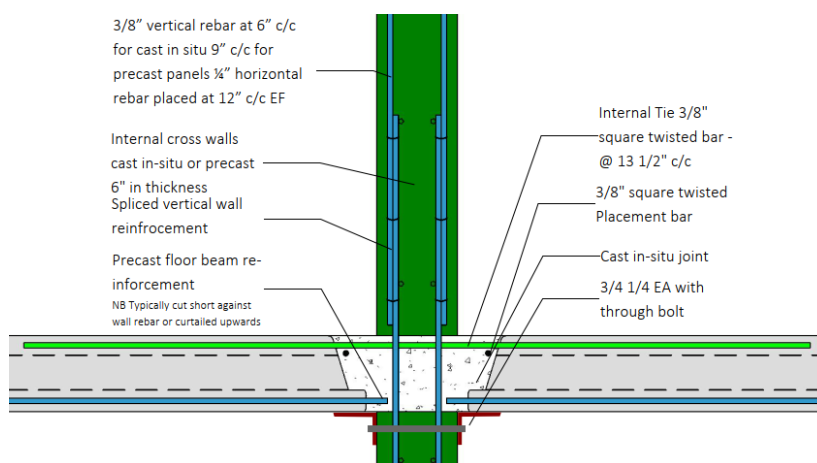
Observed Internal Wall to Floor Detail of Barton House
